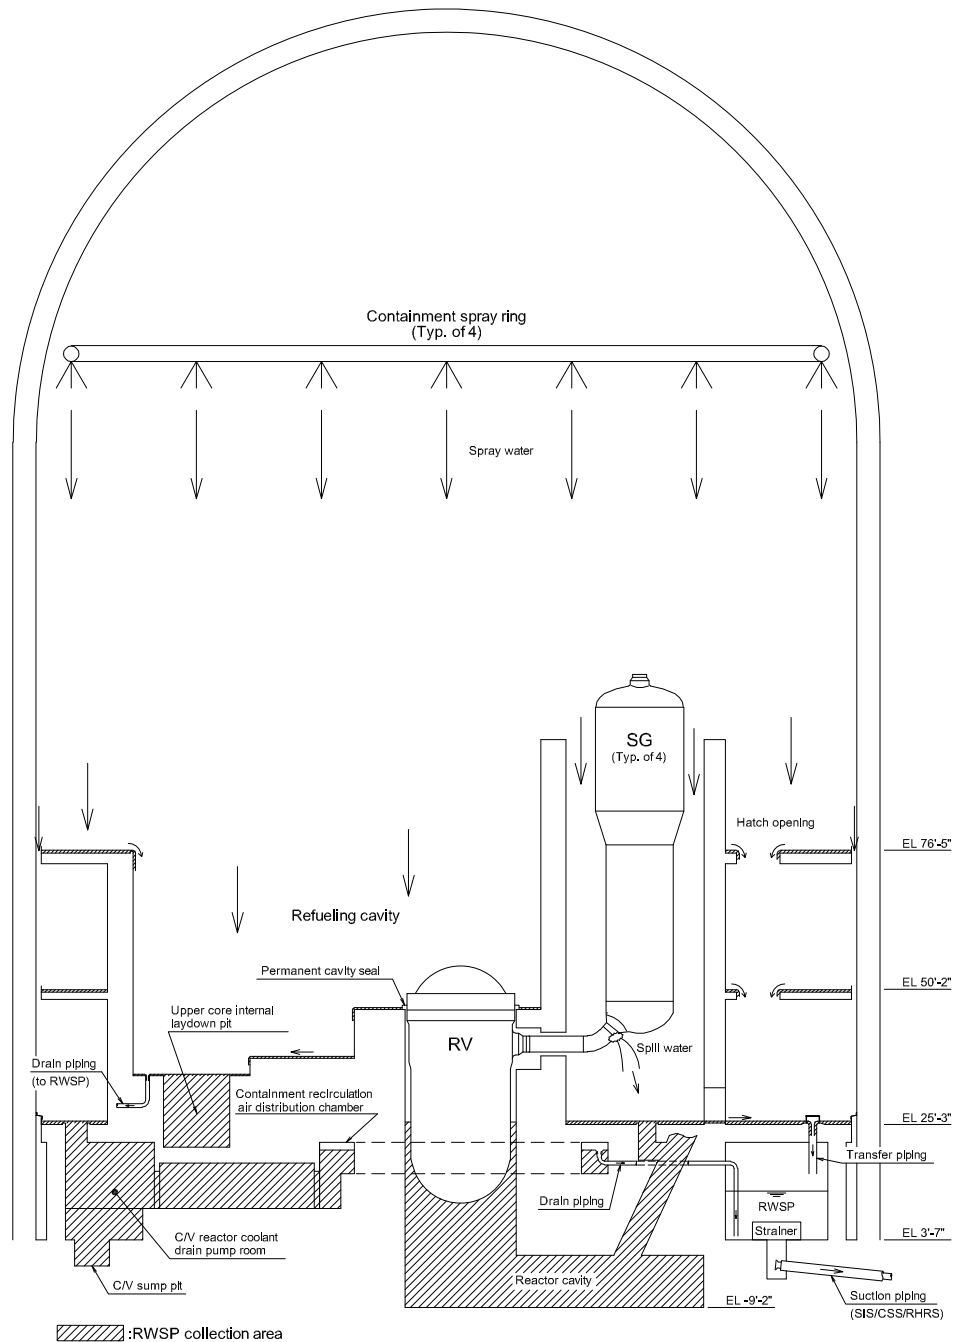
RWSP Concrete Structure Partial Sectional View
